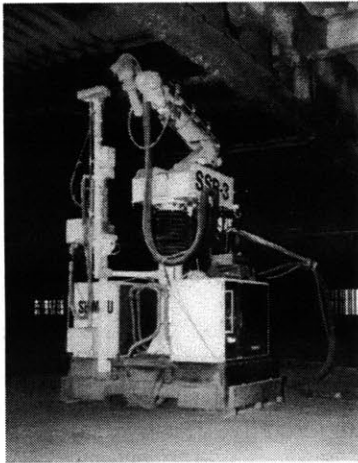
Automated welding robot - *Shimizu Corporation, Japan
